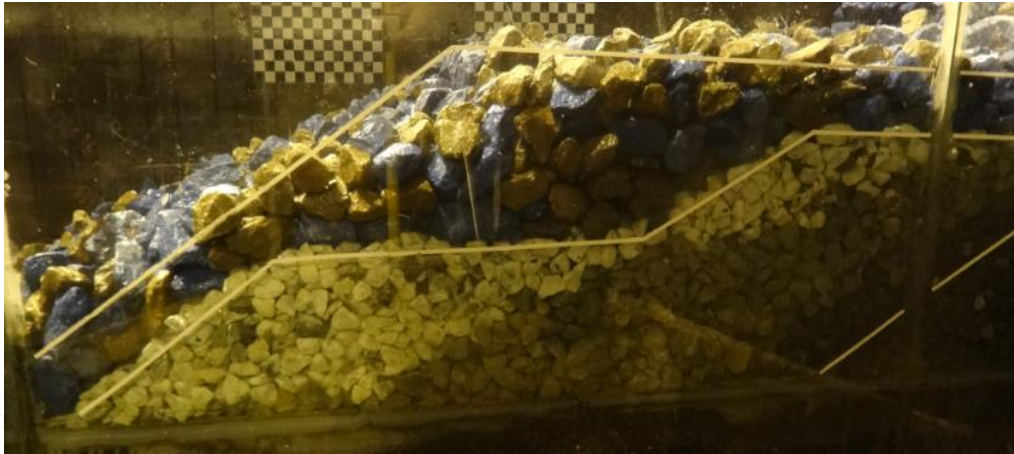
View of Section 5 after set 1 (4000 waves)
